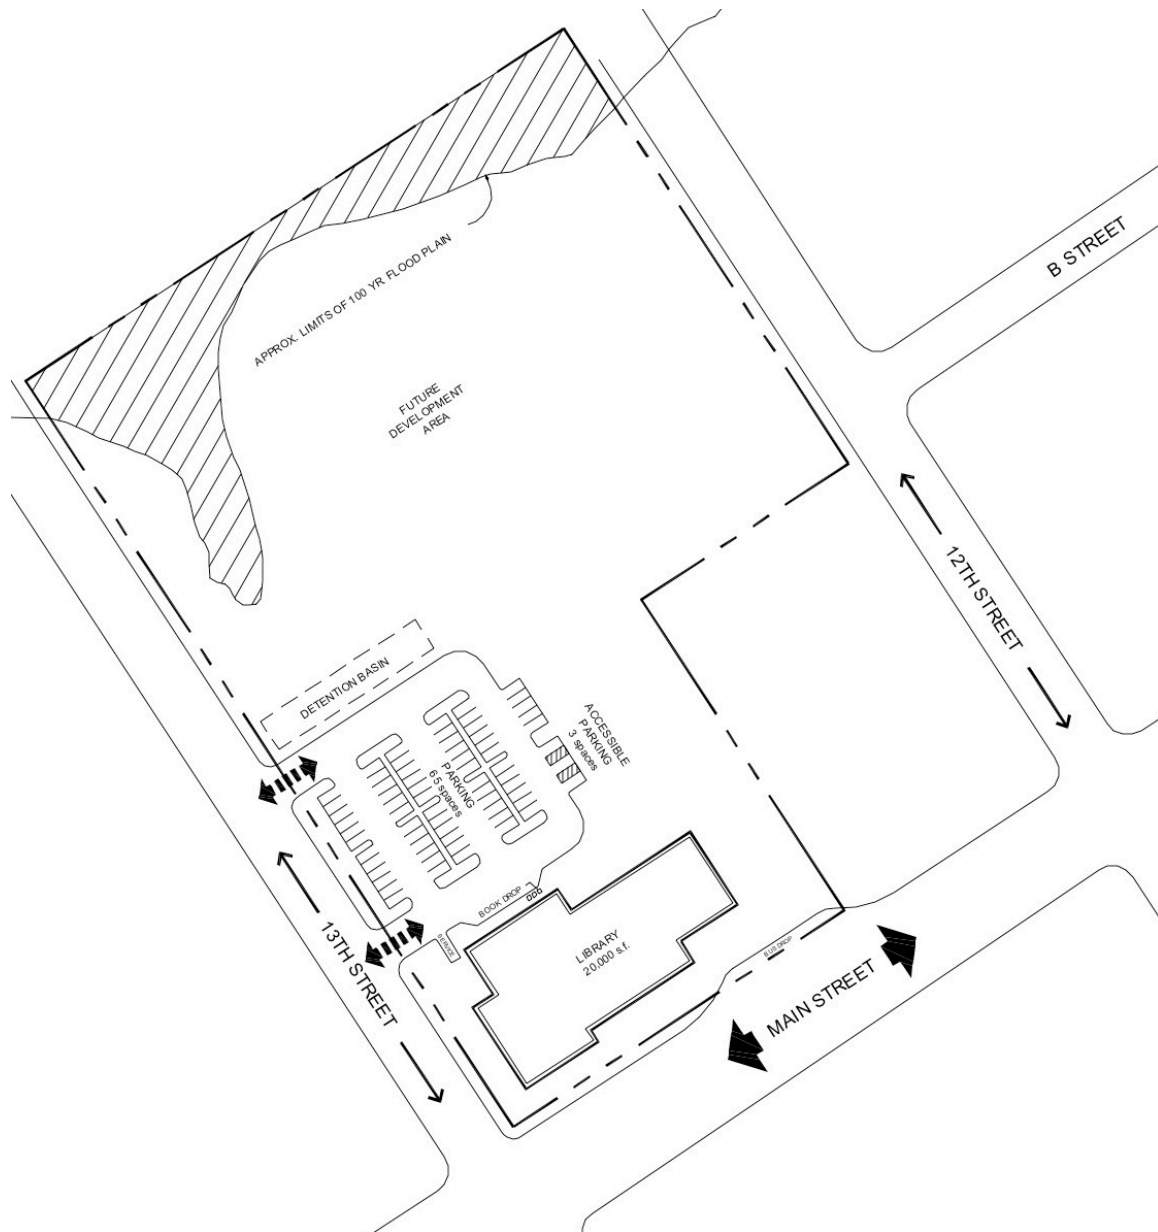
Proposed Ramona Branch Library Development Plan (HDR 5/09)
